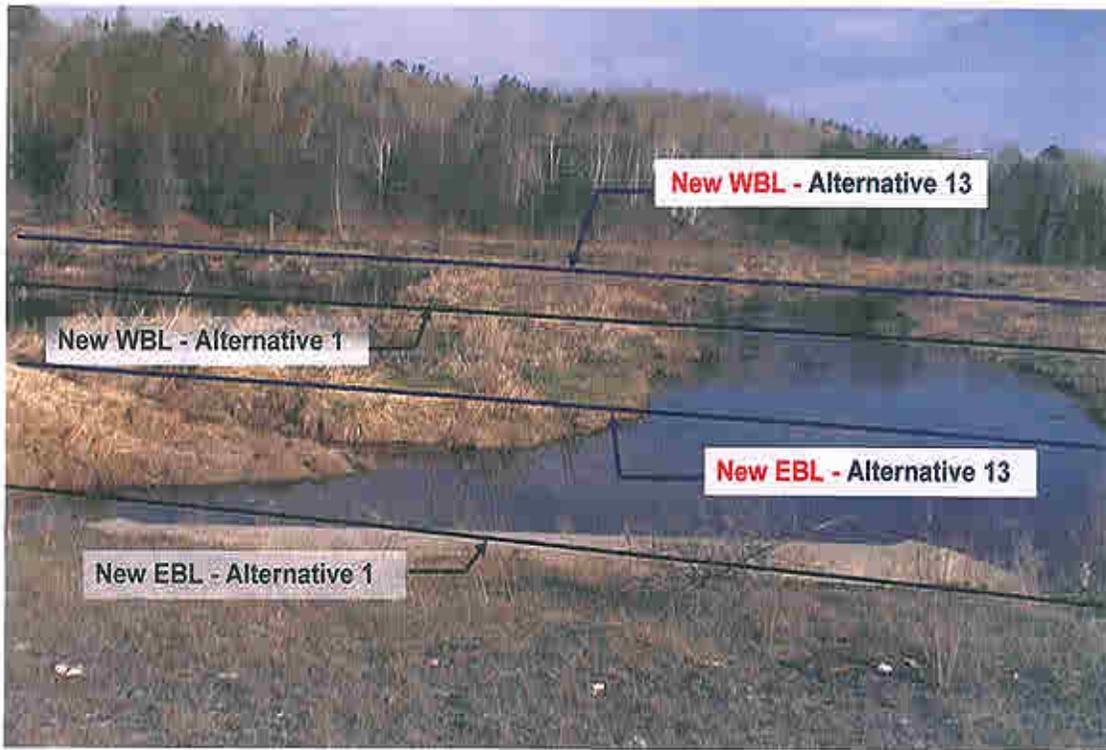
VIEW: Looking east from west side of SMR 55 at about 300 m south of SMR 55 intersection with Lindala Road. (September 12, 2006)
